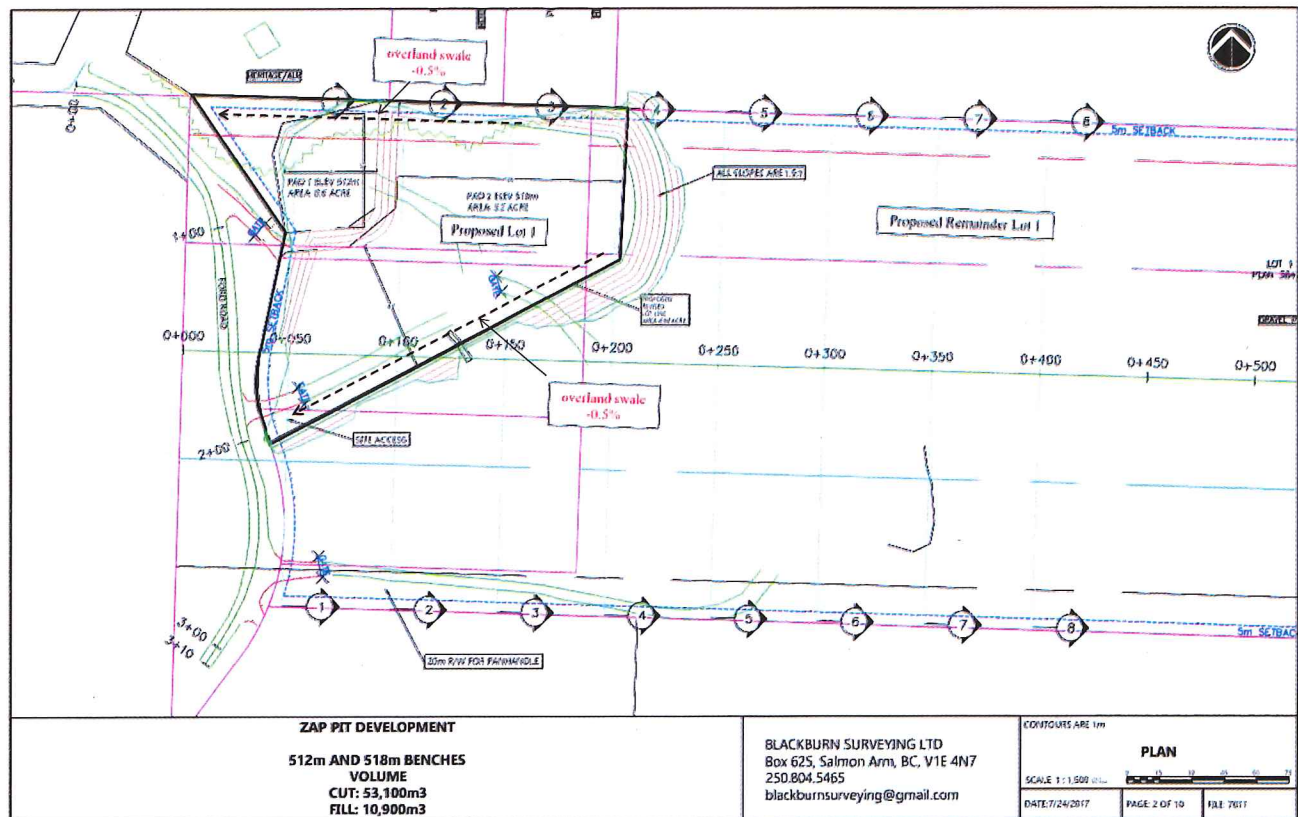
Proposed Lot Layout and proposed reclamation of proposed Lot 1.
